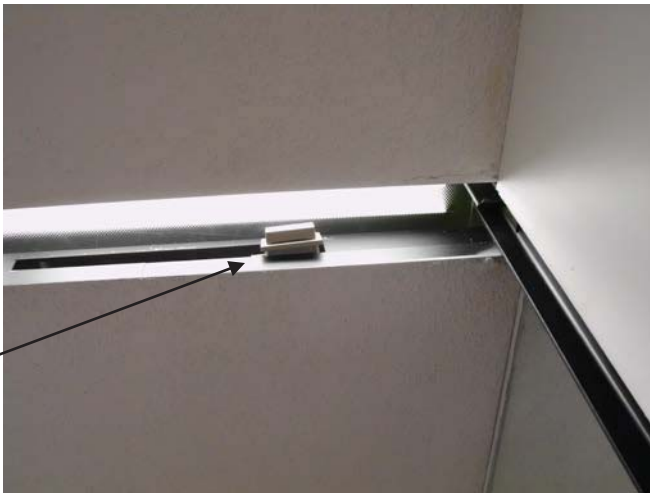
City Hall Open Office: Ceiling Mounted Thermostatic Controller.
